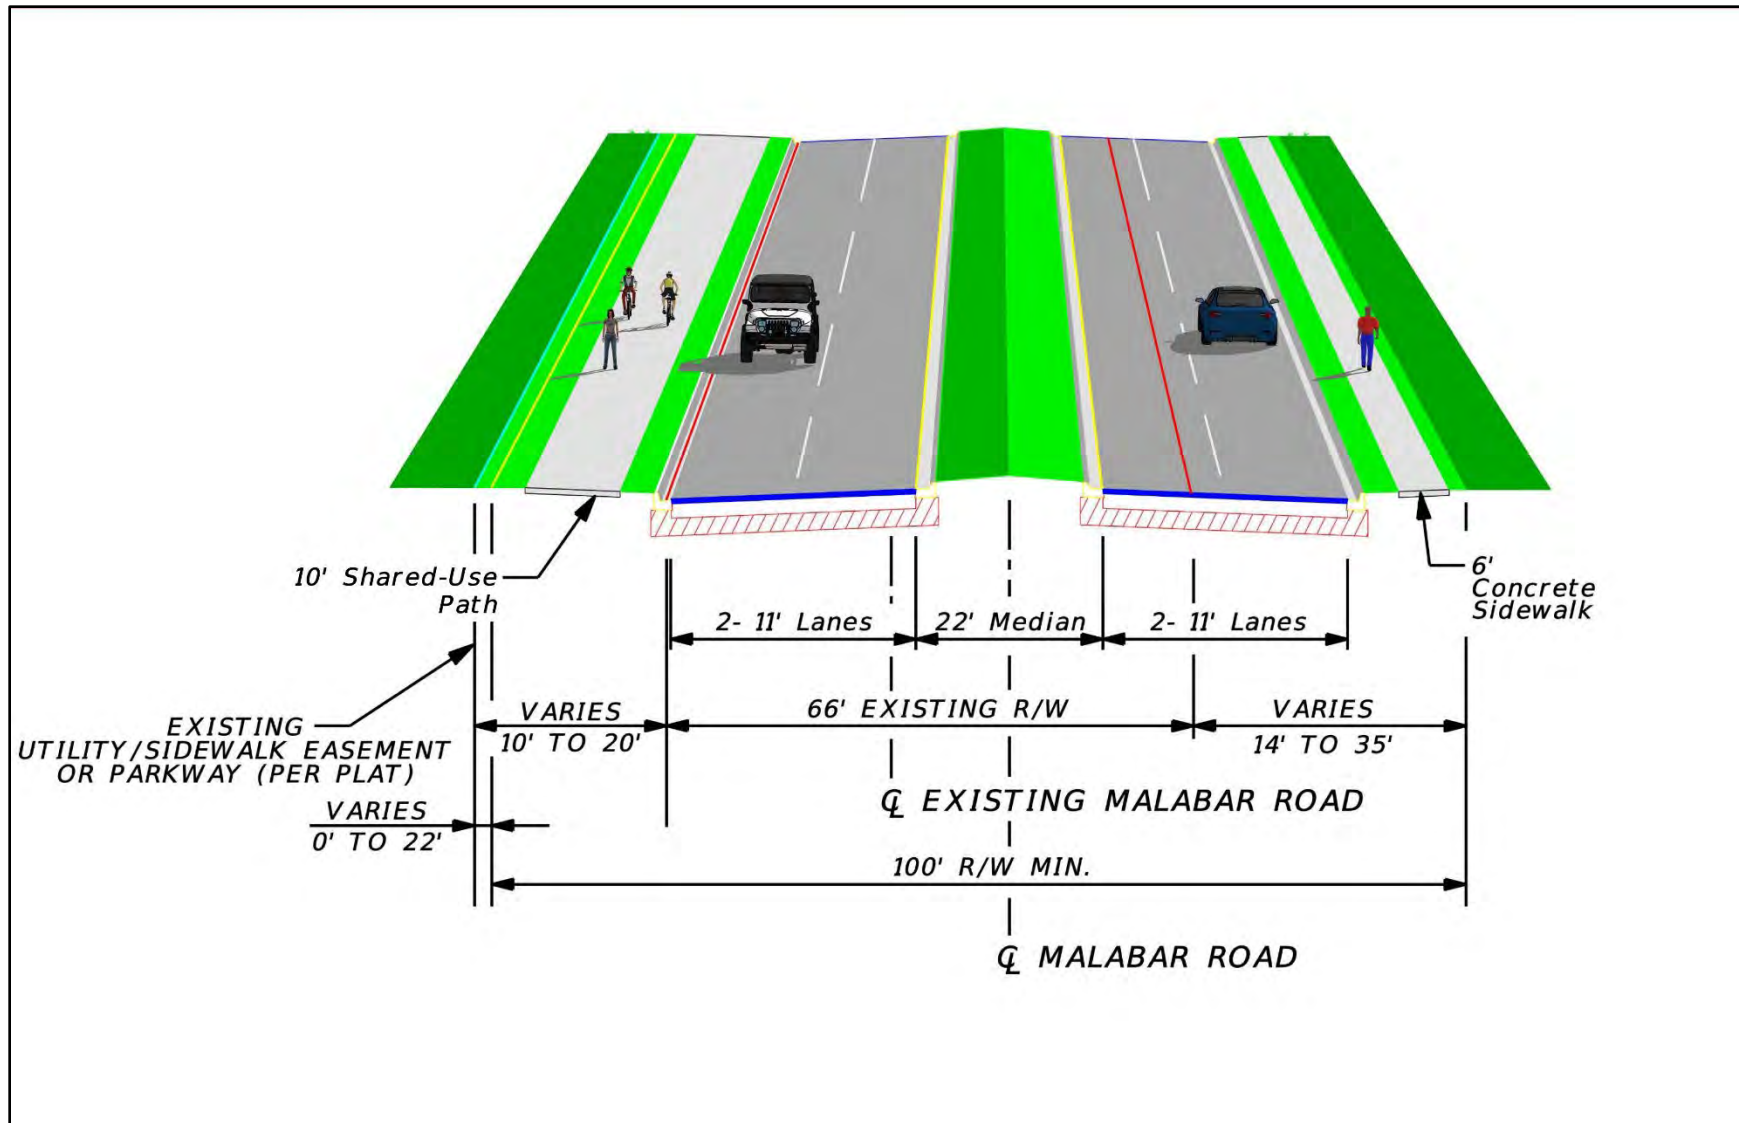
100' Alternative B – St. Johns Heritage Parkway to Canal C-10
